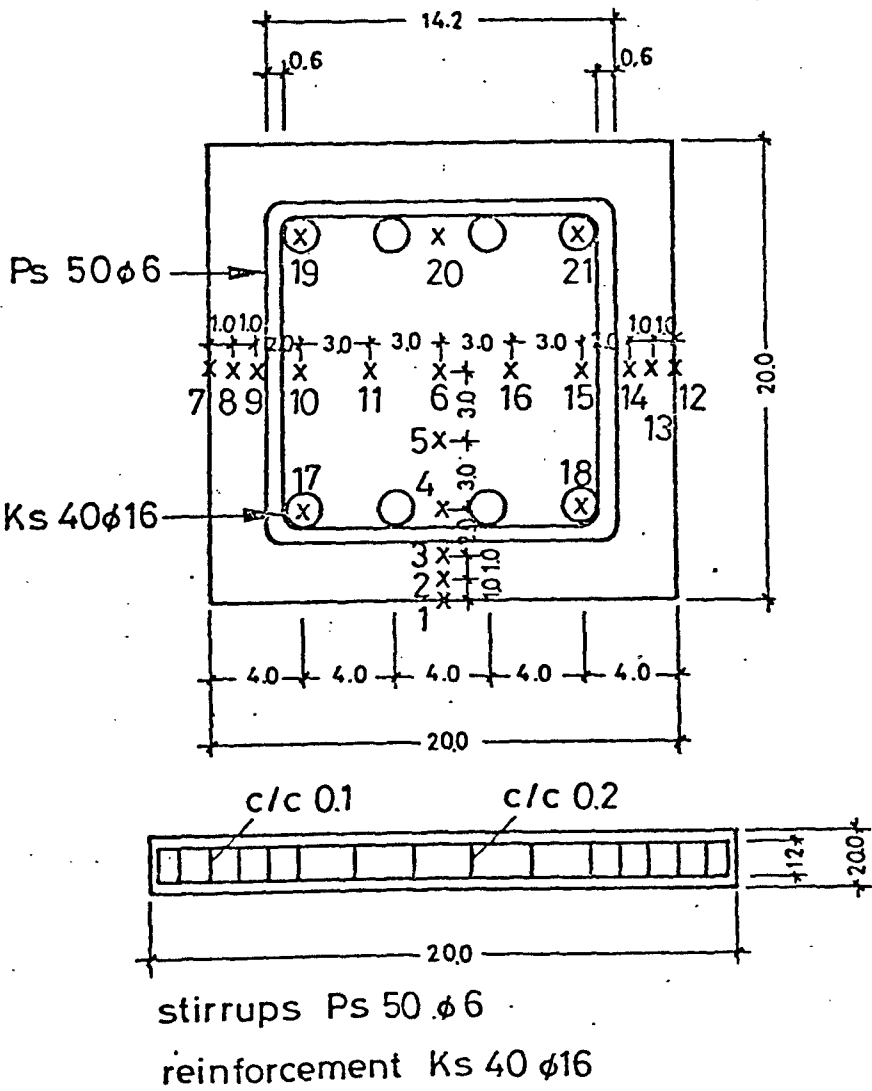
Section of column. Reinforcement and placement of thermocouples
